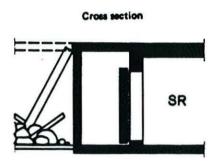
Cantilever slab safe against air blasts as protection of the entrance door against falling debris.
